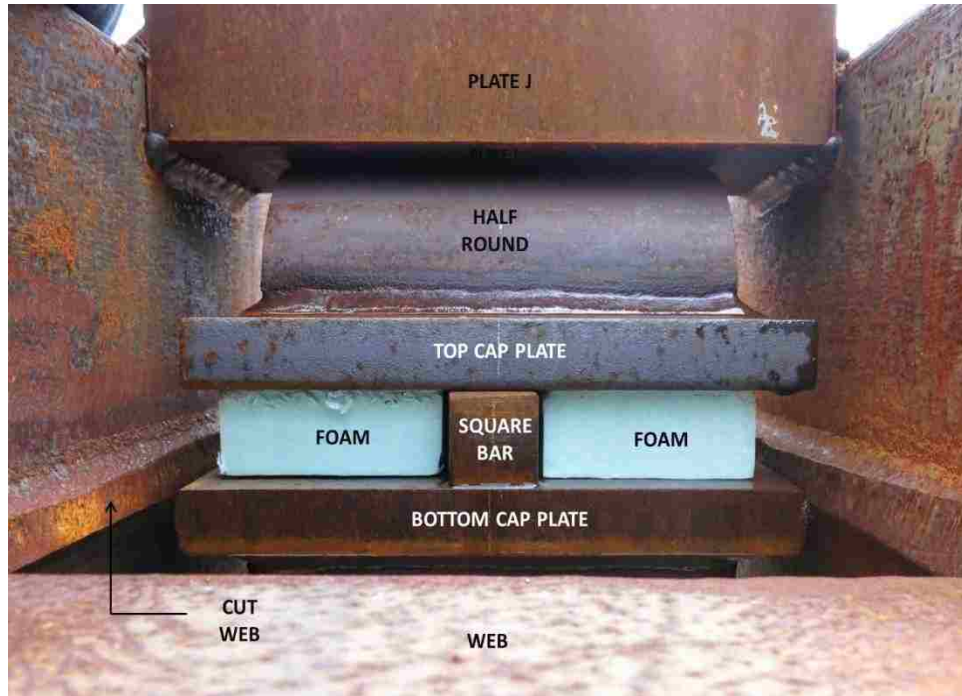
Photograph of load bearing assembly at Section Type B looking in parallel direction
